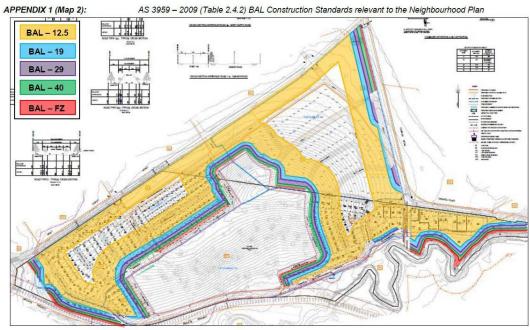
BAL Construction Standards relevant to the Neighbourhood Plan
